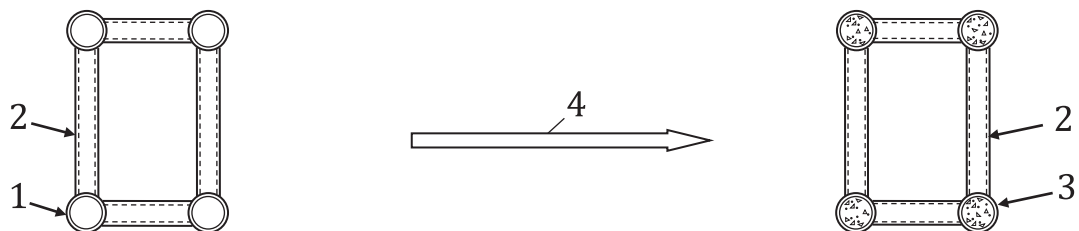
Cross-sections of trussed CFST hybrid structures with circular CFST members
